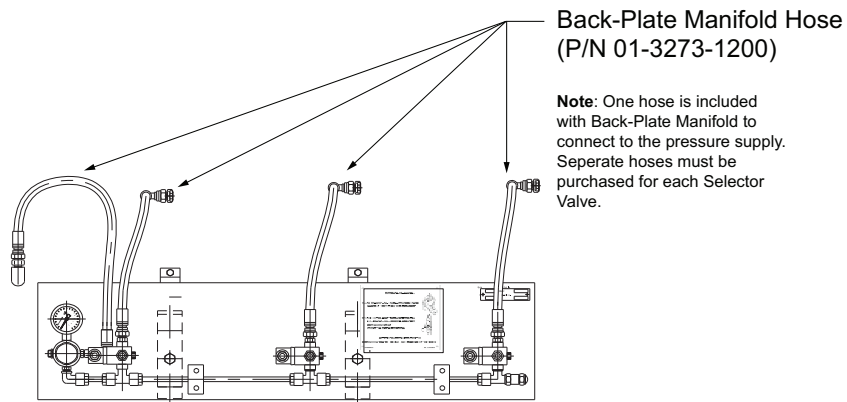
Back-Plate Manifold Hose Installed on Back-Plate Manifold
